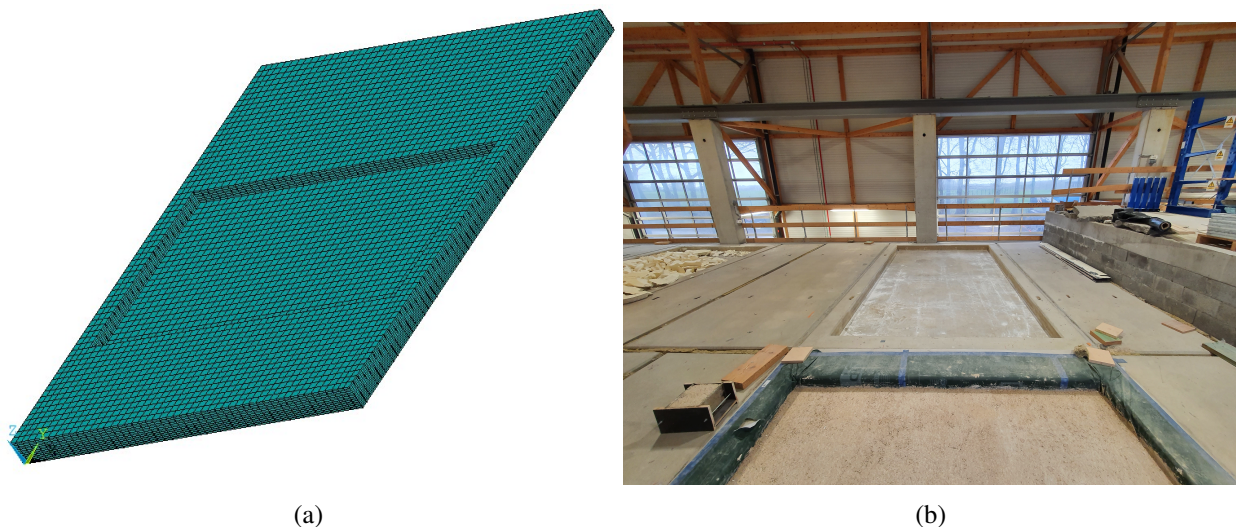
Full structure, including the test element and the adjoining thick, concrete slabs: (a) FE model of the full structure and (b) laboratory setup.
